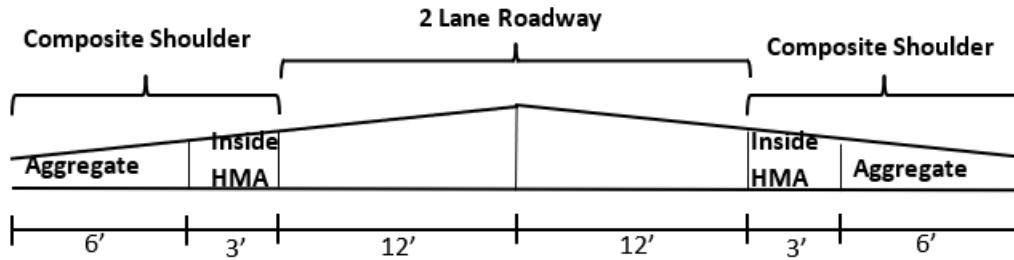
Cross Section of Pavement in Shawnee1 and Shawnee2
